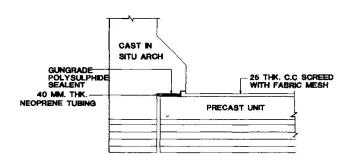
Details of Joint between Precast Unit and Cast-in-Situ Arch
